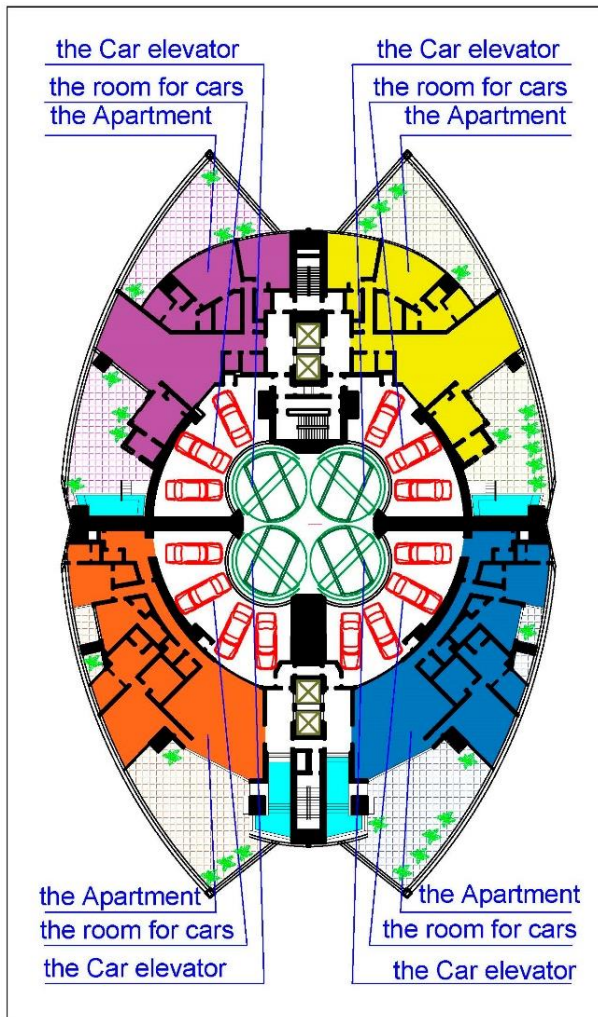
“The Neue Grand”, Melbourne City, 2024 (a typical floor plan) [66]
